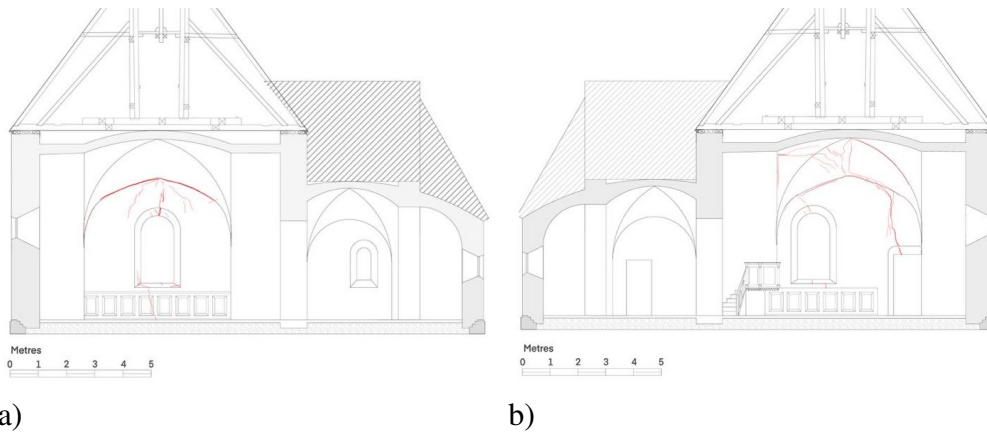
Section view of Skörstorp's Church from crack-investigation 2025 with cracks marked in red a) North and b) South
